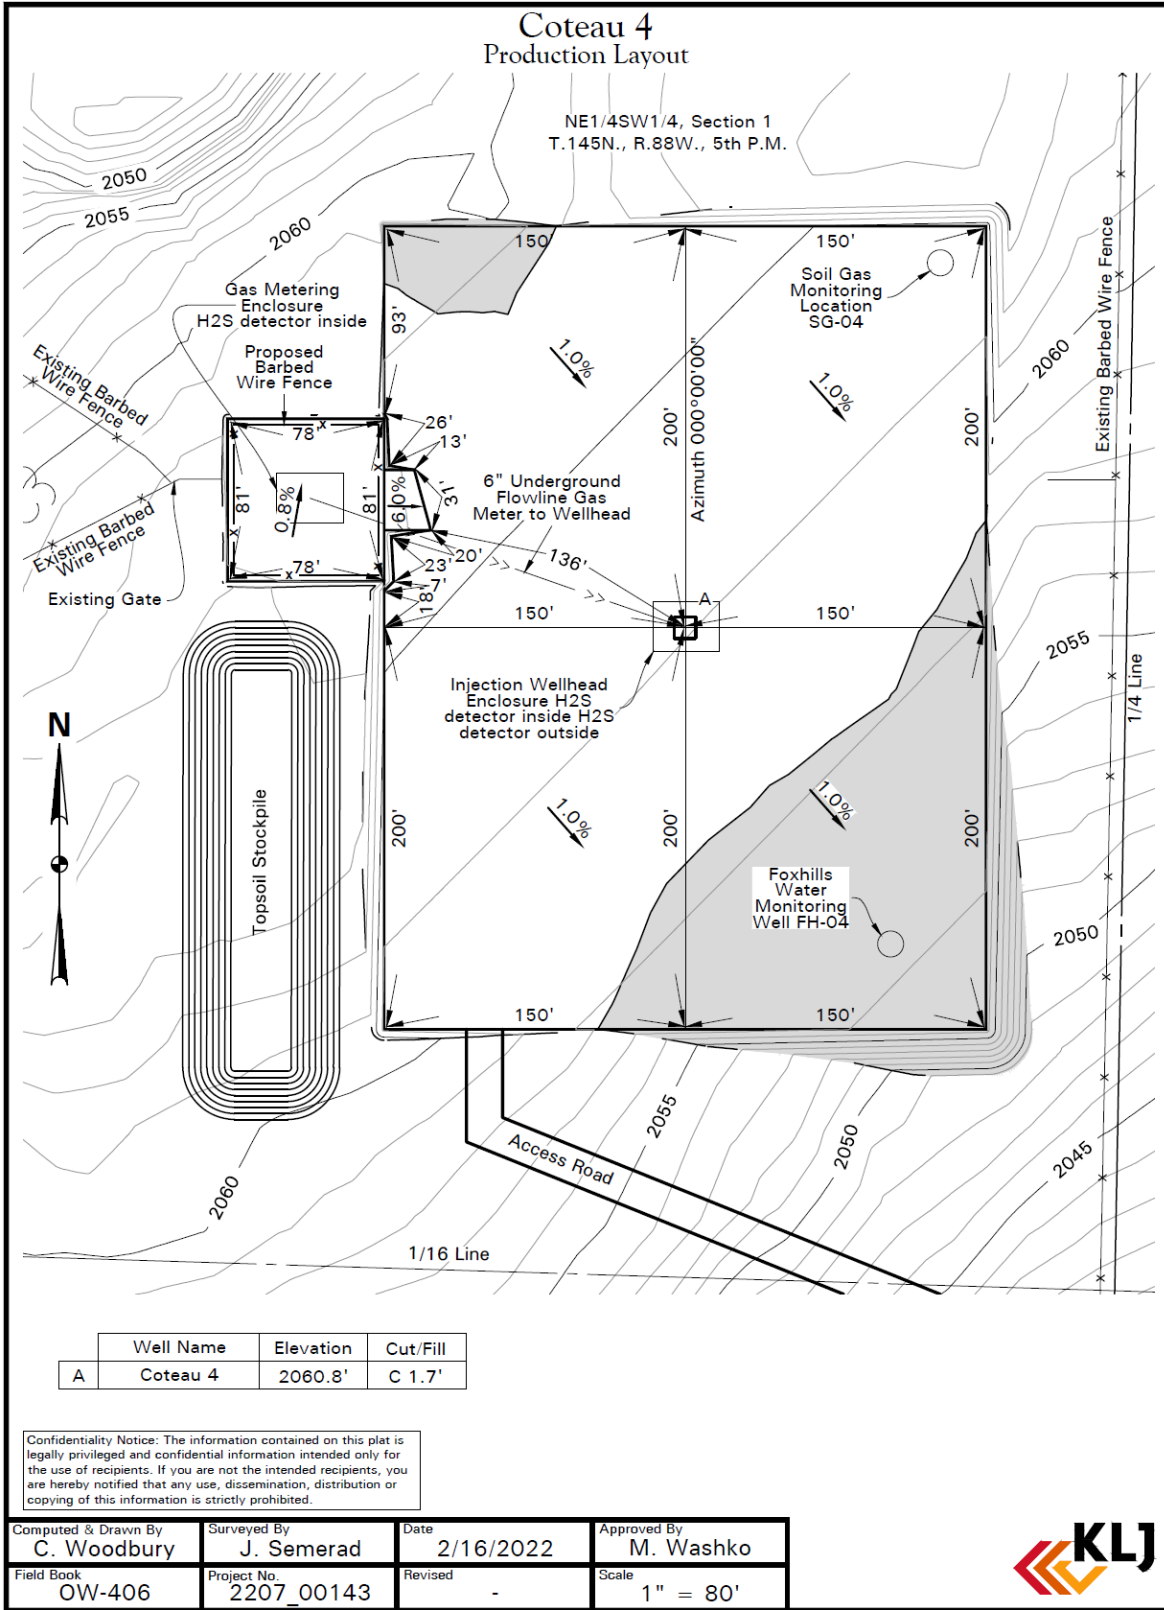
D. Well pad drawing of the Coteau 4 well location.
